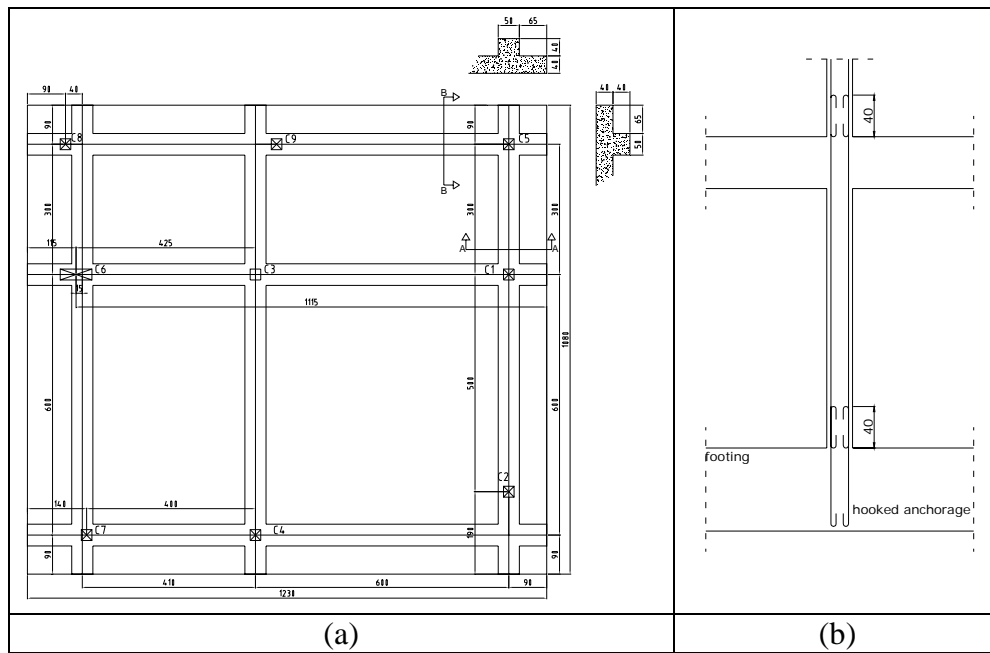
Footings plan view (a) and longitudinal reinforcement lap splice
